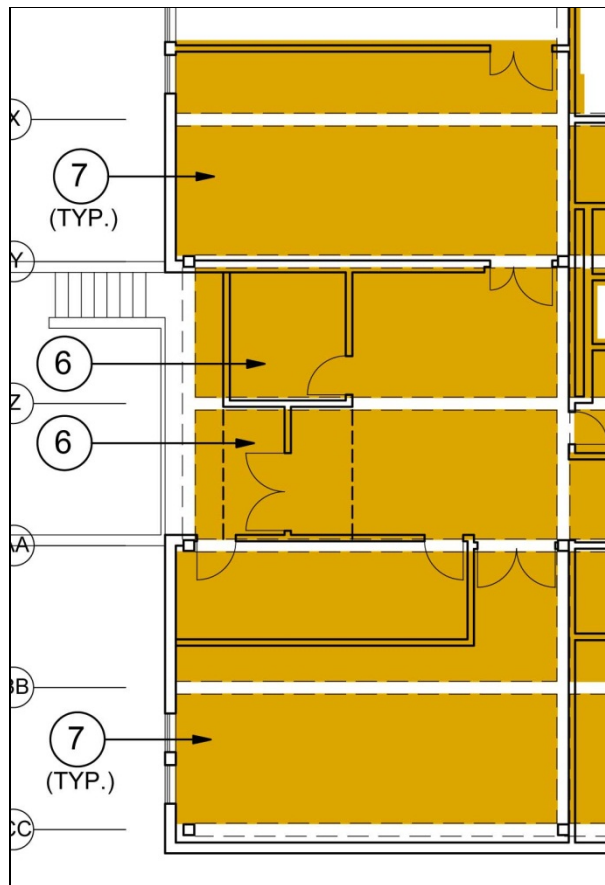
Plan of receiving and custodial area. Areas in orange indicate existing Tectum form plank to be removed. 6 = areas of form plank to be removed above existing suspended ceilings; 7 = areas of existing exposed form plank.
